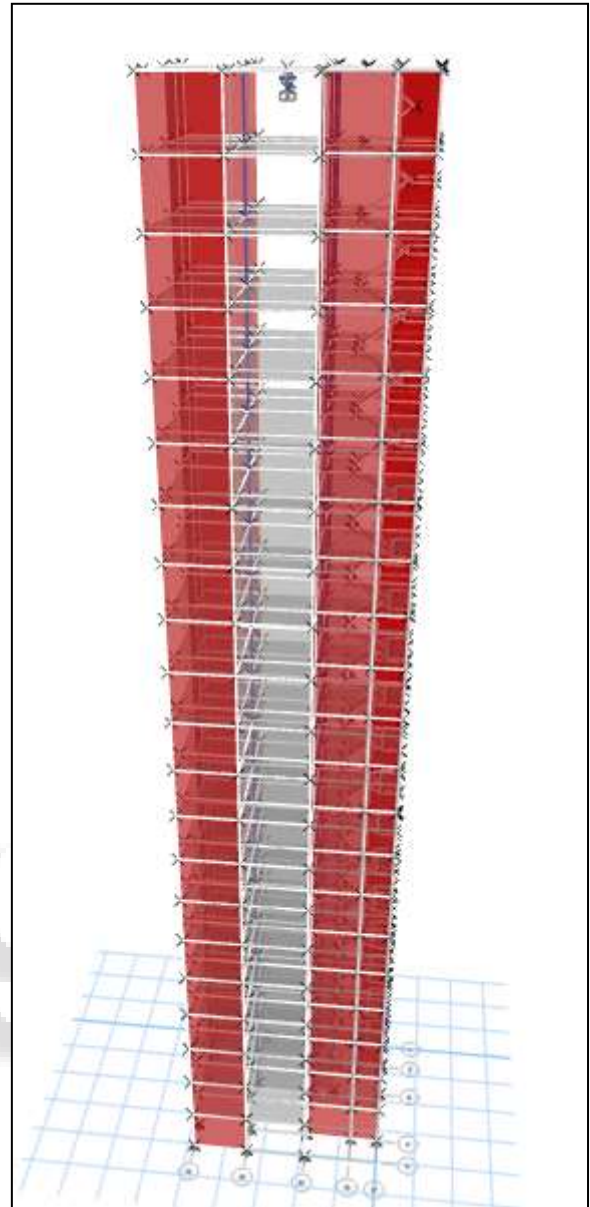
model (3) Isometric view of G+ 20 Residential building model with shear wall and tune mass damper
